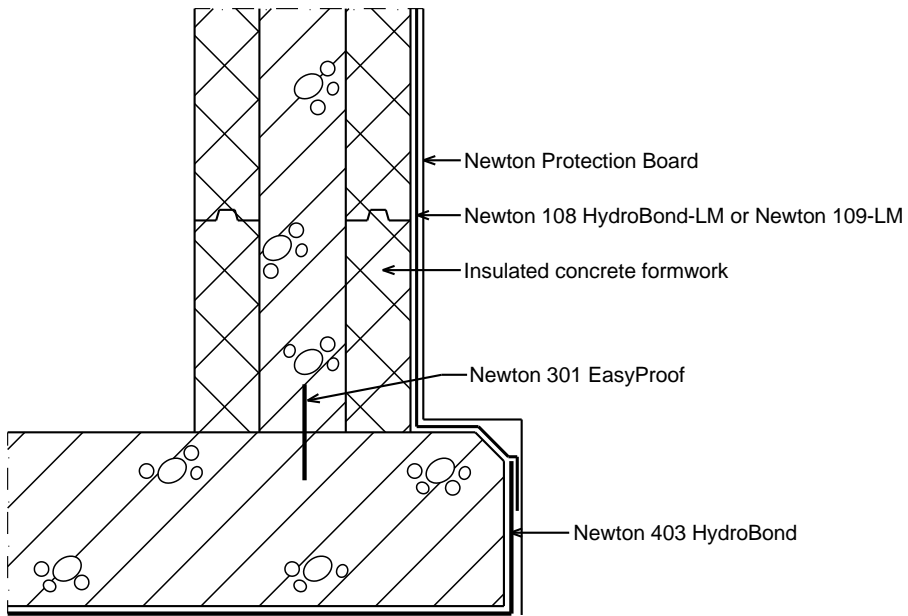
Typical detail of interface between concrete slab and basement wall with Newton 403 HydroBond
